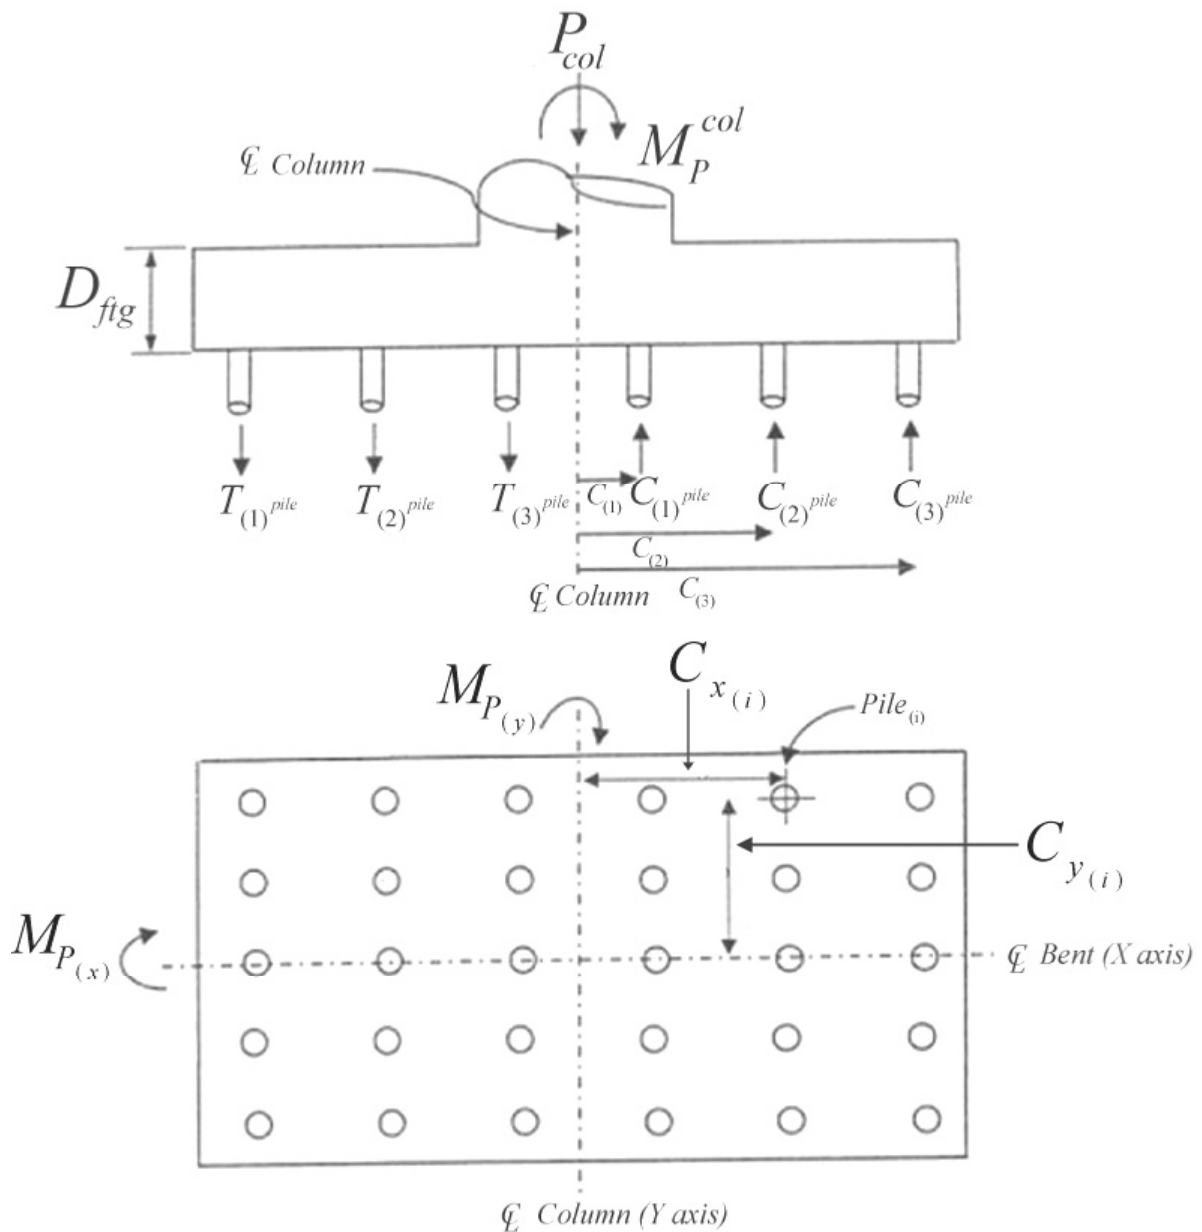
Simplified Model for Pile Foundations in Competent Soil
